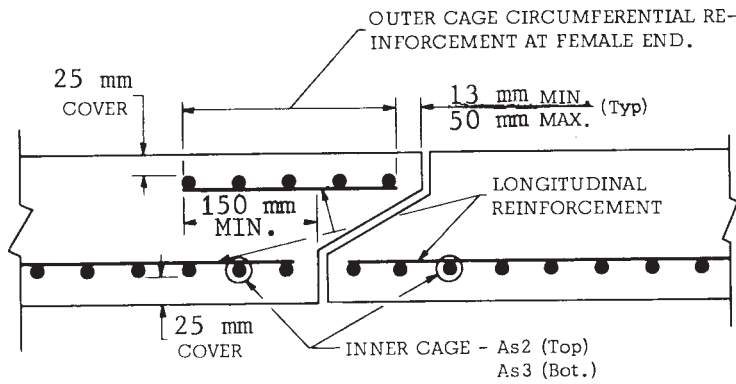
Section A-A Top and Bottom Slab Joint Reinforcement
